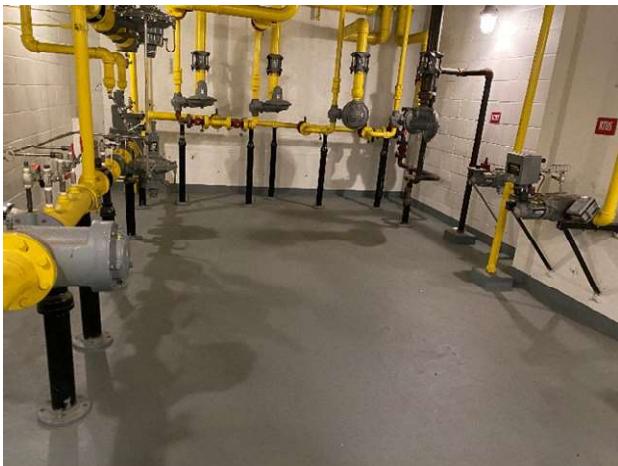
View slab in gas meter room of 45-40 Center Blvd. (C241095)
